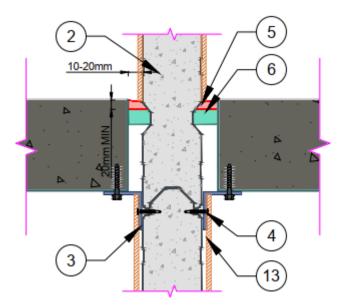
Dual wall system with vertical wall between horizontal walls – gap width of 10-20 mm between the stair and horizontally oriented wall
